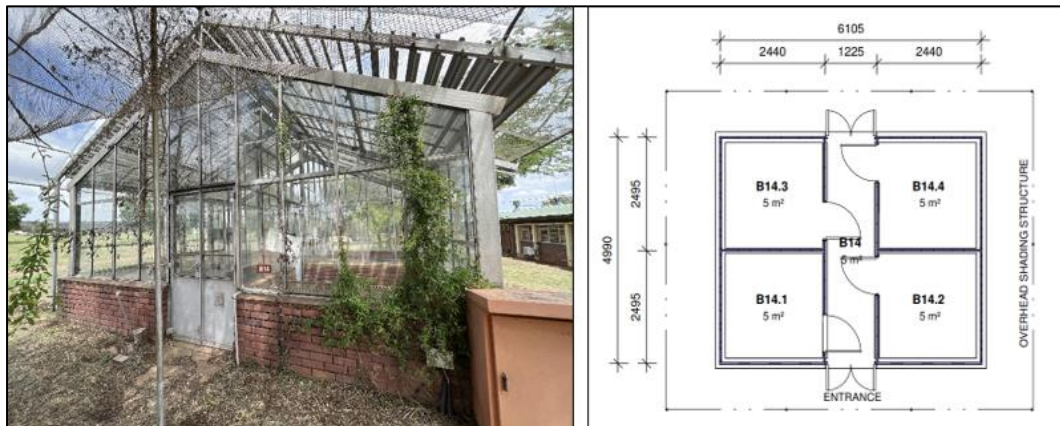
EXISTING B14 GREENHOUSE STRUCTURE & FLOOR PLAN
